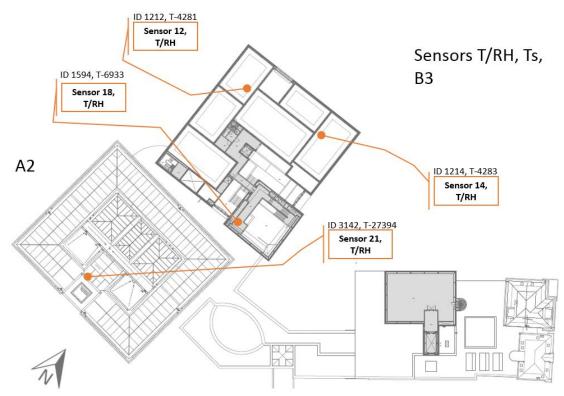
T/RH/T_s sensors, measurement locations A2 and B3, floor plan under layer by Cahen (2003).
